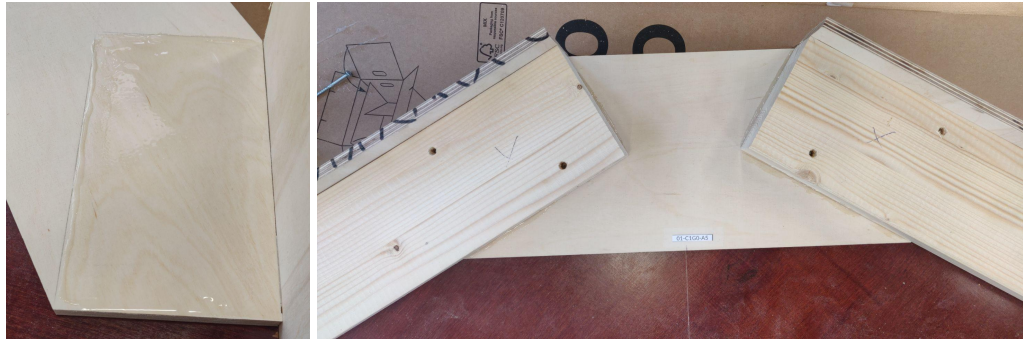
Glued surface (to the left), first layer of glued plate and member assembly with small screws (to the right)
